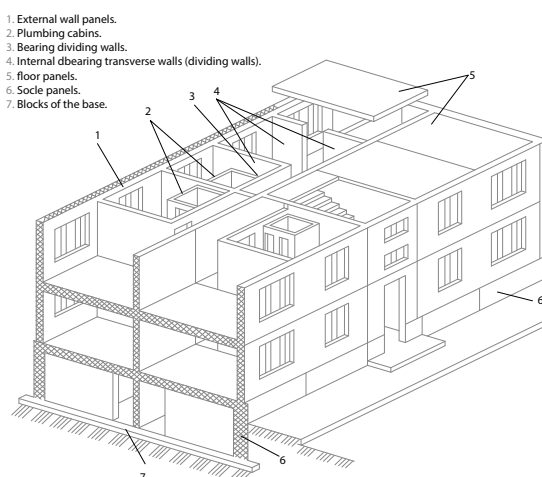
Figure 4: Structural scheme of a large-panel building with the transverse and longitudinal load-bearing walls
